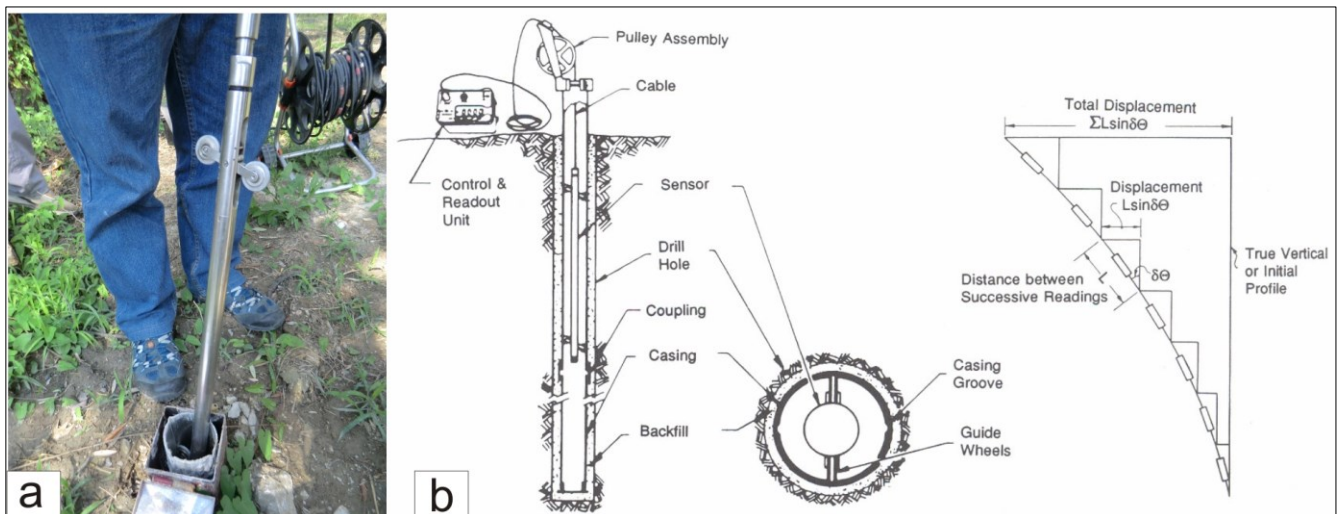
Probe inclinometer lowered in a stainless inclinometer casing (a) and scheme of its installation and reading inside a borehole (b).
